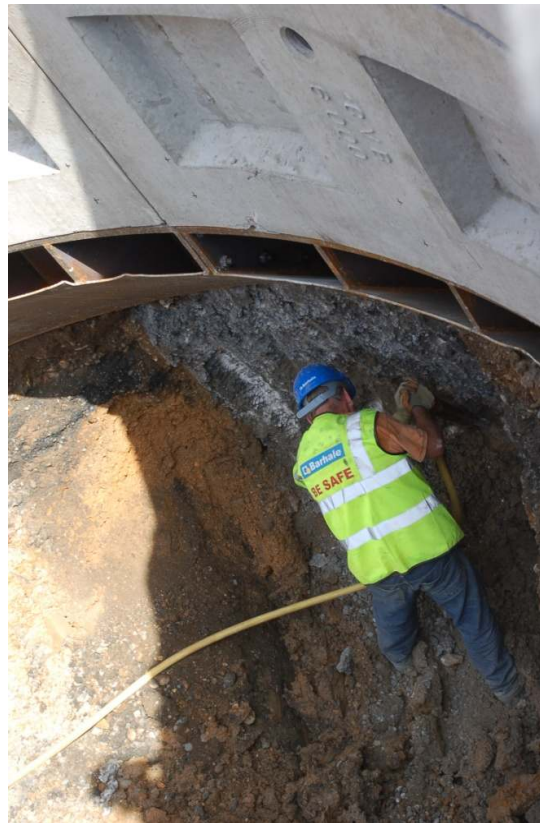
Excavation of the concrete in the southeast corner using a mechanical drill.
